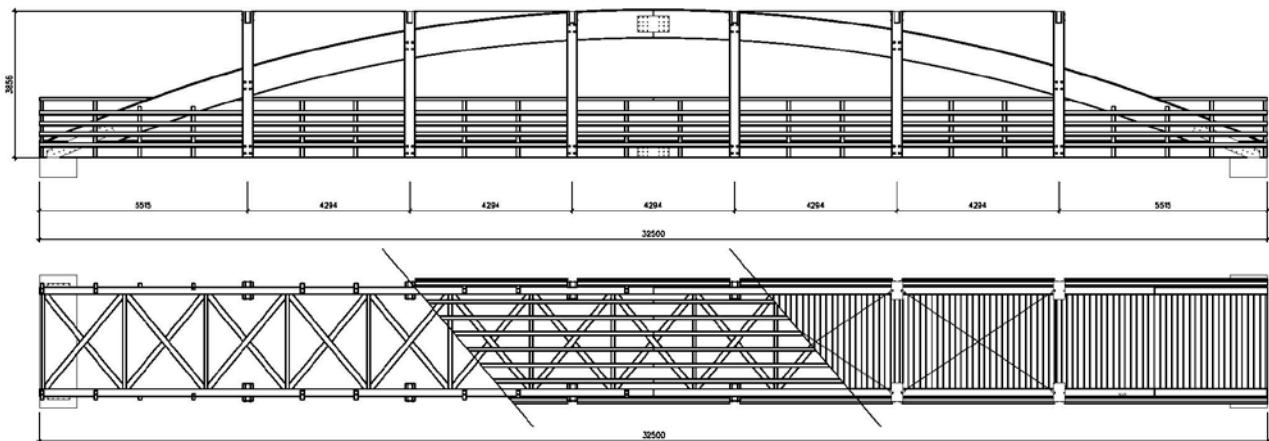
Plan of the tide-bow bridge 32,5 m span and 3 m width
